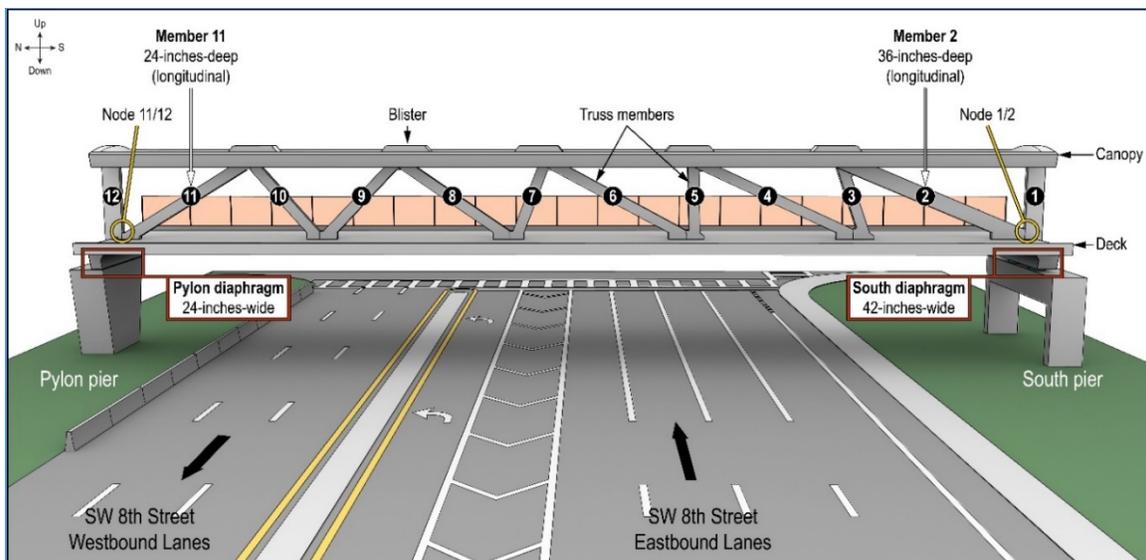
Nomenclature of bridge components and numbering of diagonal and vertical truss members on main span of pedestrian bridge, east view.
